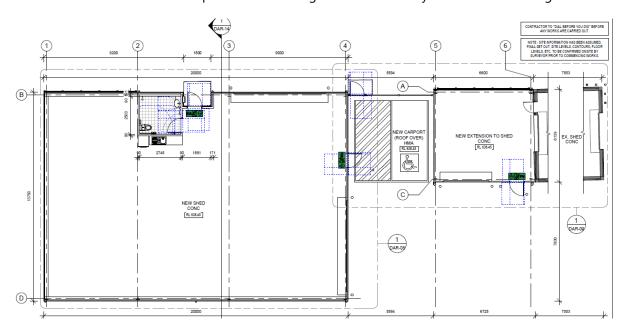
Proposed New Shed Floor Plan (Existing Shed is to the right) - TLA
